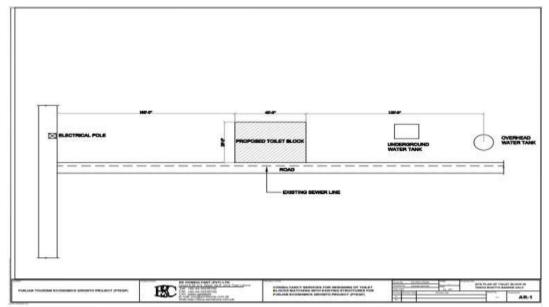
Proposed site for new toilet block at Tench Bhatta Bazar Site I
